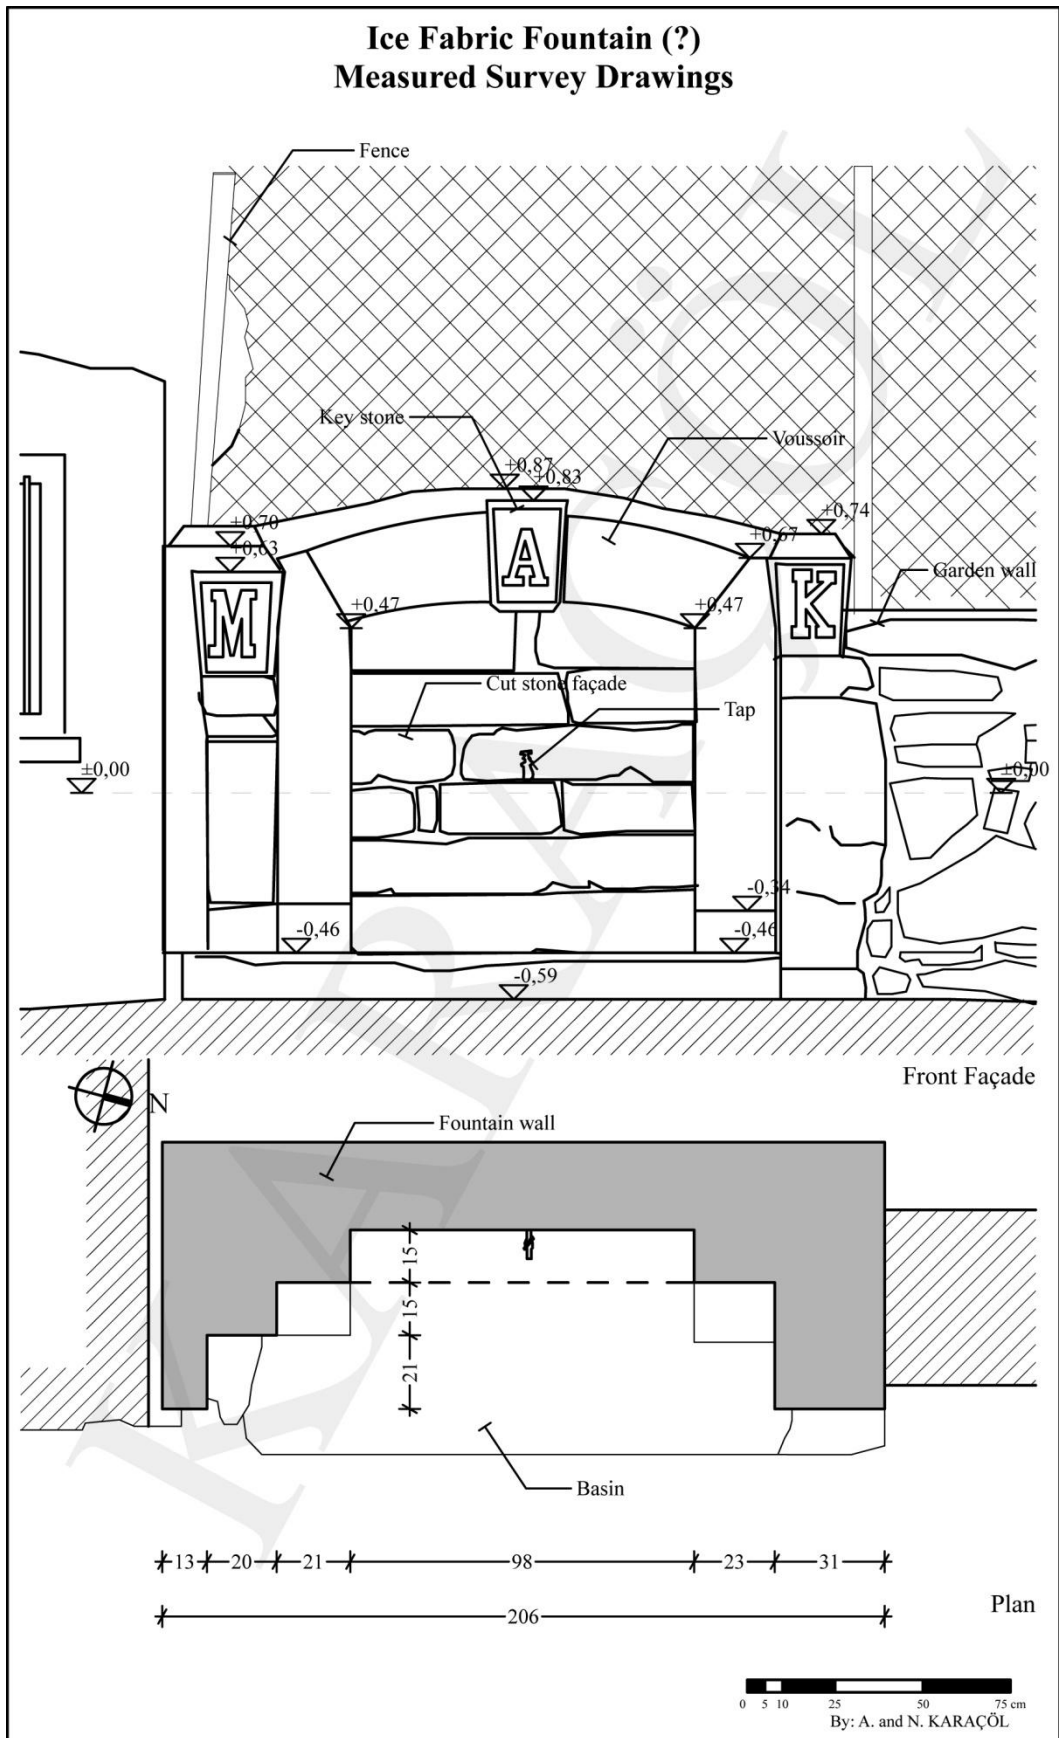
Ice Fabric Fountain front façade and plan drawings
